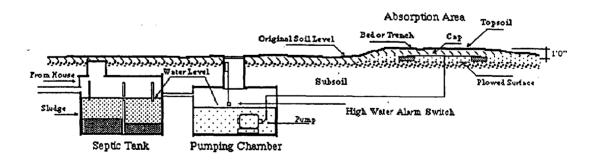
Shallow mound section view (www.greenbuilder.com)
